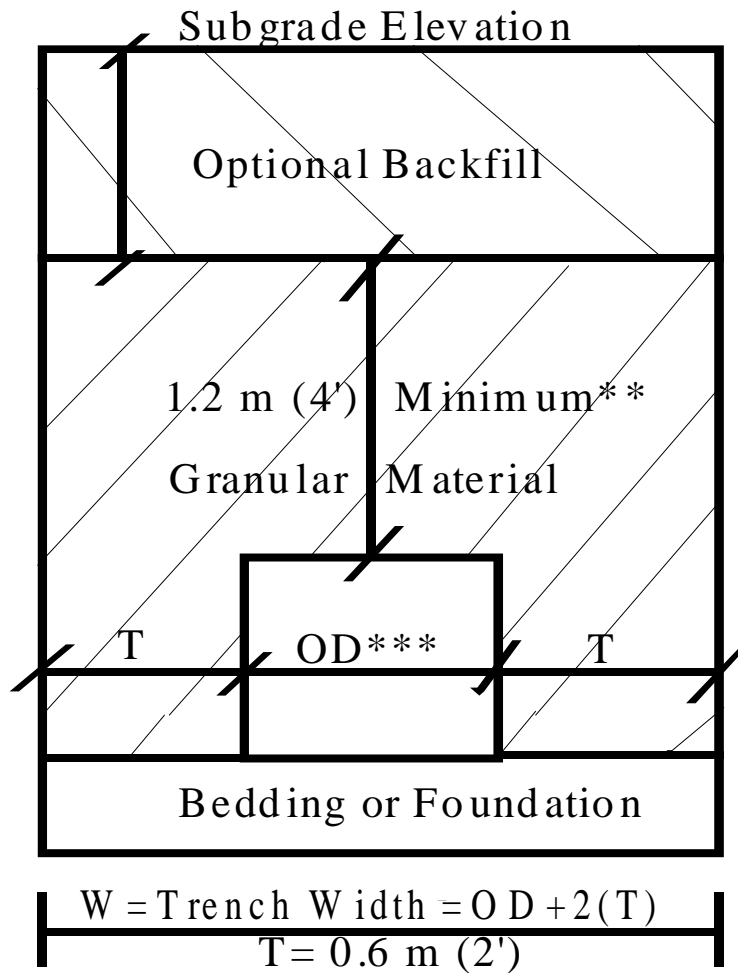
Backfill for Large Conduit Structure in a Cut
